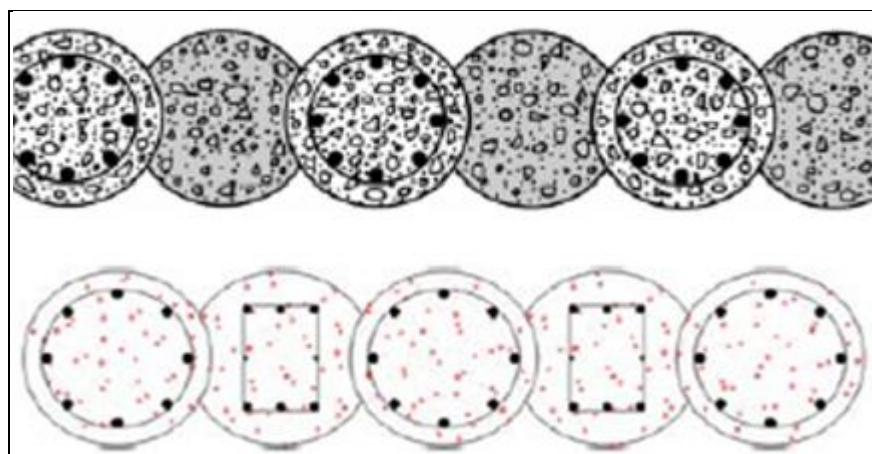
Pile wall-Secant hard/hard cross-sections [12]
